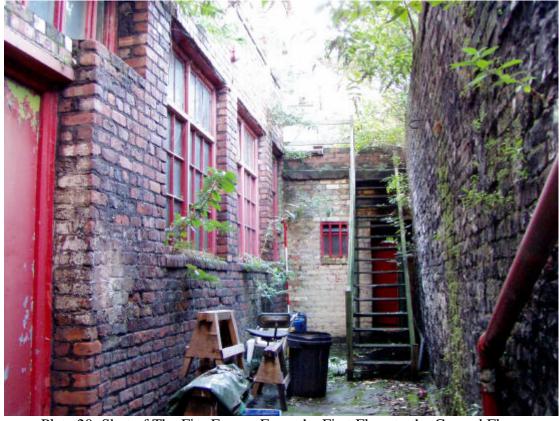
Shot of The Fire Escape From the First Floor to the Ground Floor
